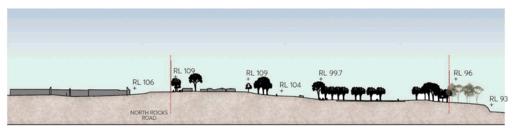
Cross-section showing local terrain with the subject site and adjacent shopping centre
